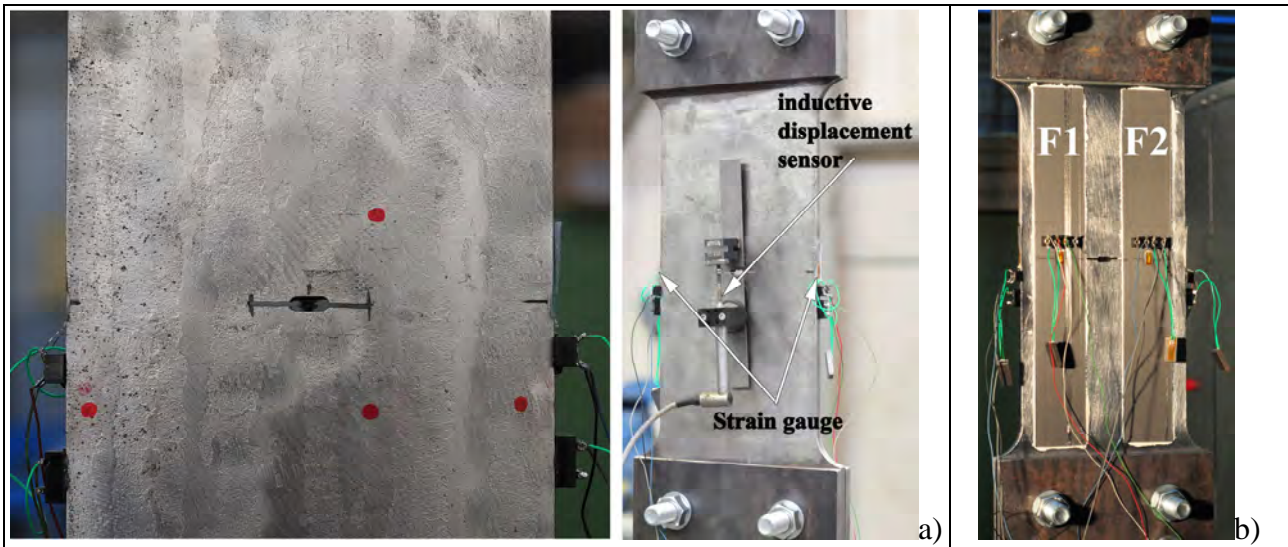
a) Specimen without improvement, b) Specimen with improvement
